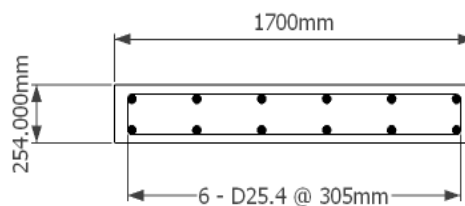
Dimensions and reinforcing for coupling beam in the shear wall.
